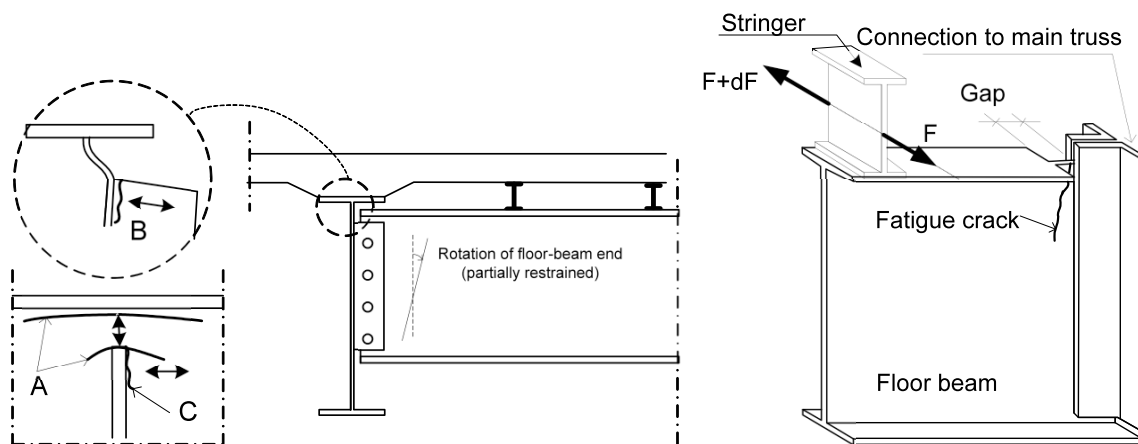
Fatigue cracking by the two different interaction types in floor-beam to main girder connections.
